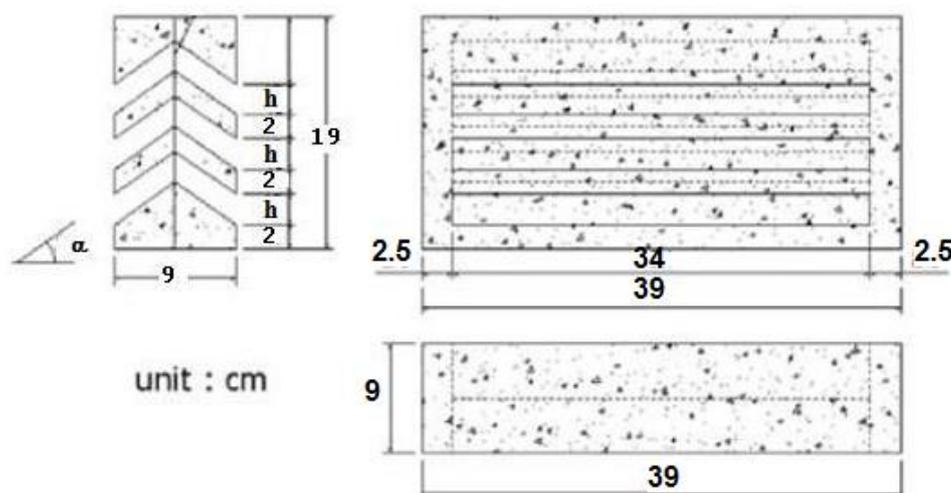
Dimensions of the vented concrete block with reverse V-shape (Λ) opening [3].
